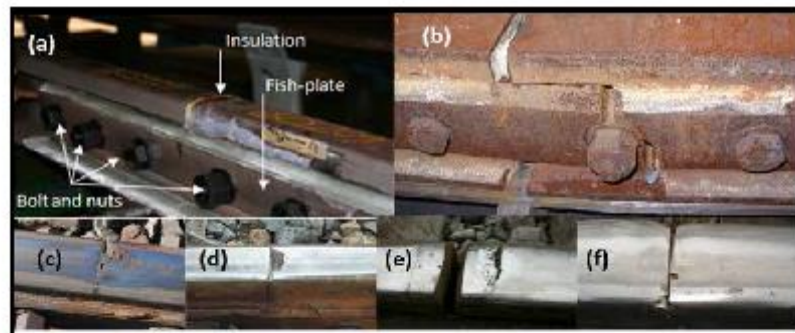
Insulated rail joints and some common failure modes, (a) IRJ assembly [Ref], (b) Fishplate fracture in vicinity of bolt hole, (c) – (f) failure modes associated with surface damage, (c) Rail end battering and metal flow, (d) rail end shelling, (e) rail head spalling and (f) railhead crushing to produce a surface dent.
